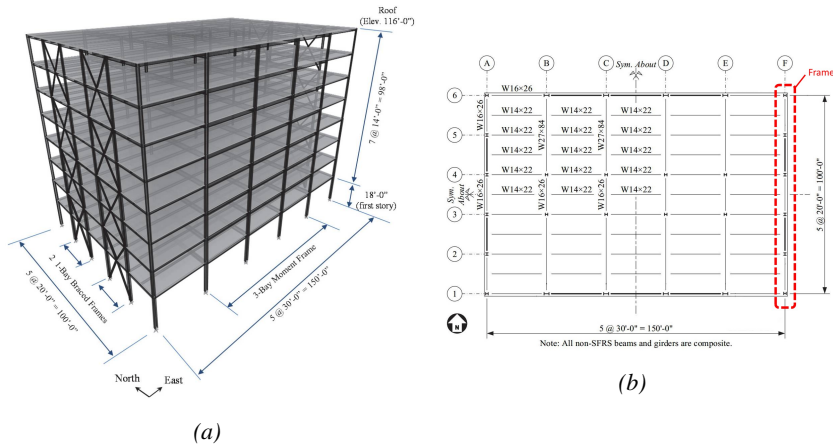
Building [19]: a) Isometric view b) plan view.
